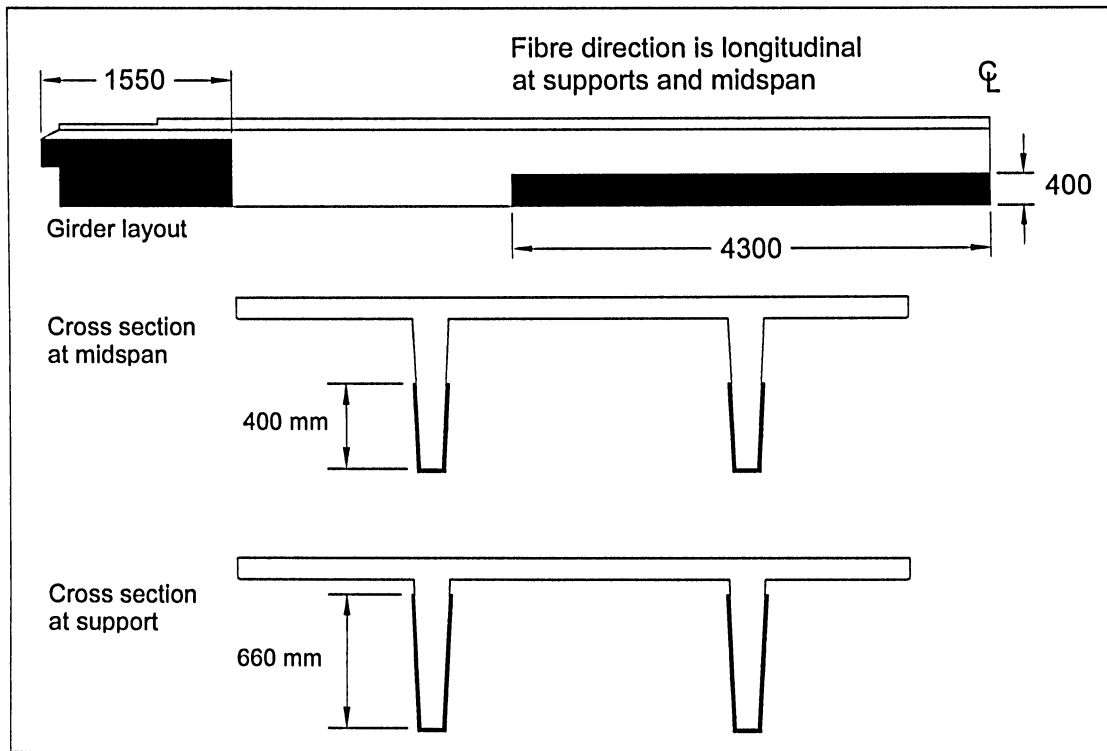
DT-41 girder CFRP layout (Cofini, 2005)
